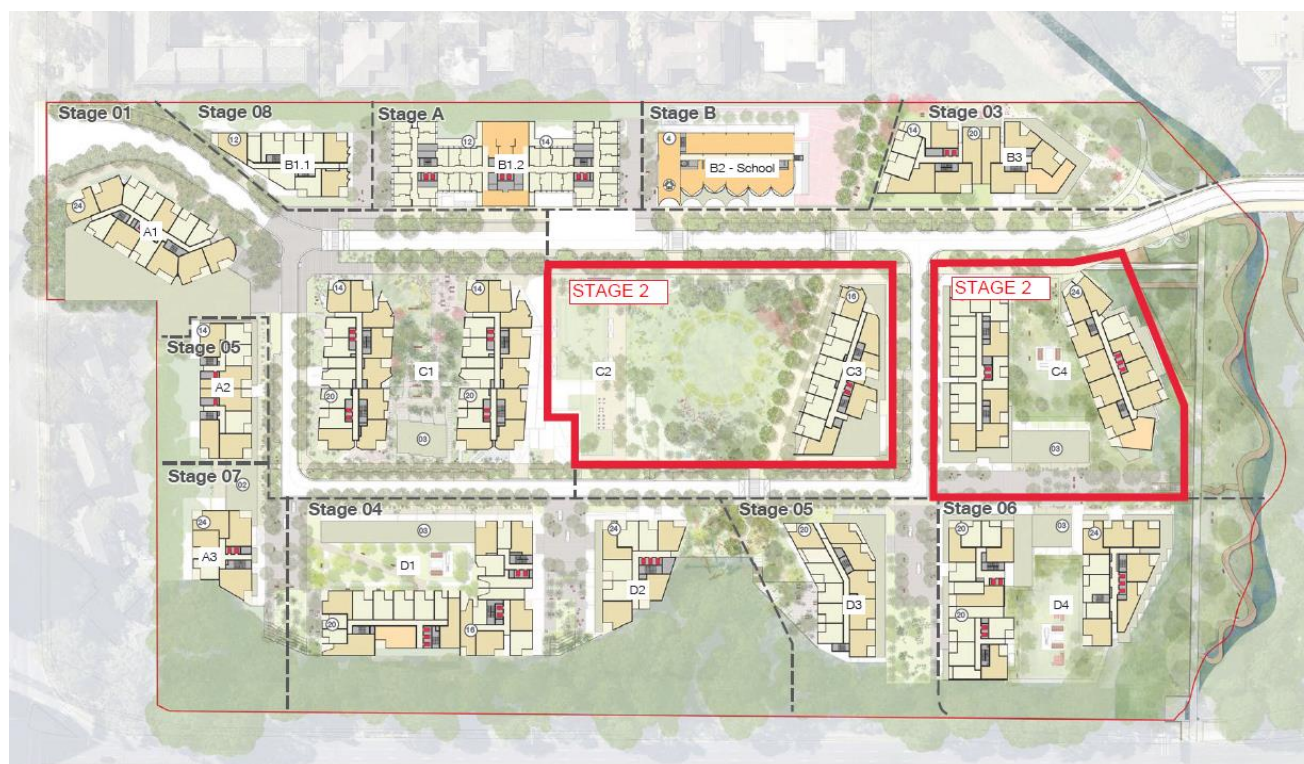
Ivanhoe Concept Masterplan staging plan, with the Stage 2 area highlighted
